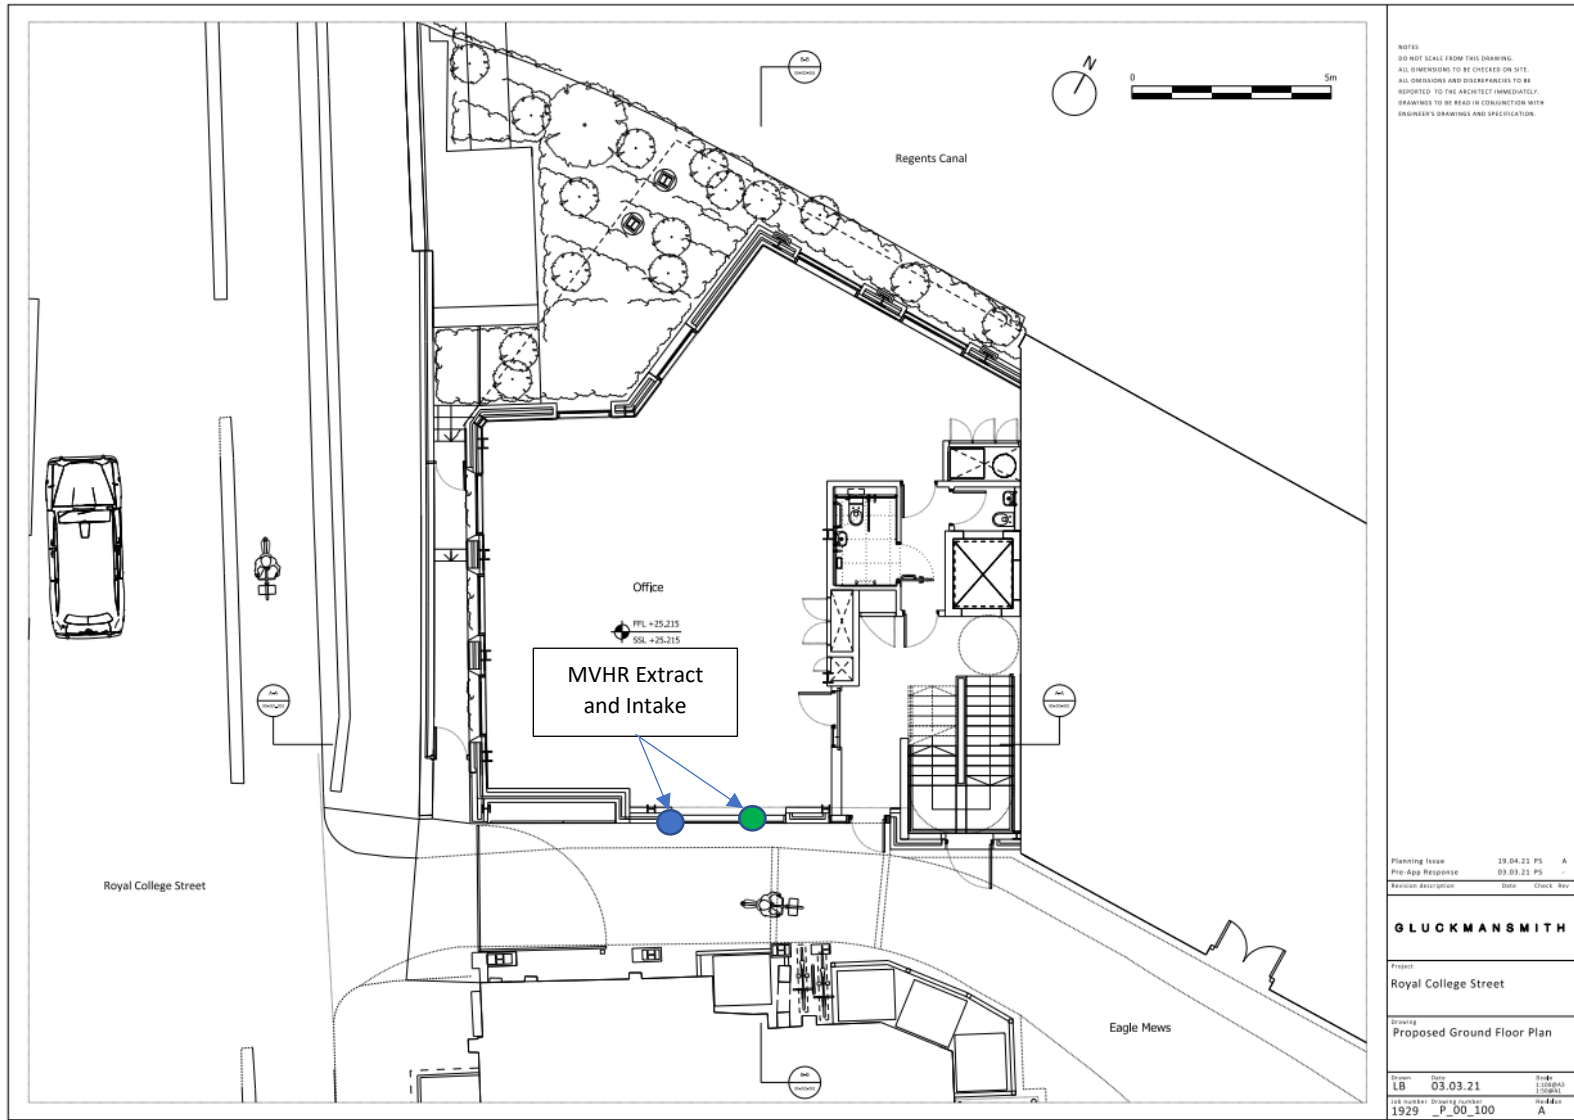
PROPOSED GROUND FLOOR PLAN
